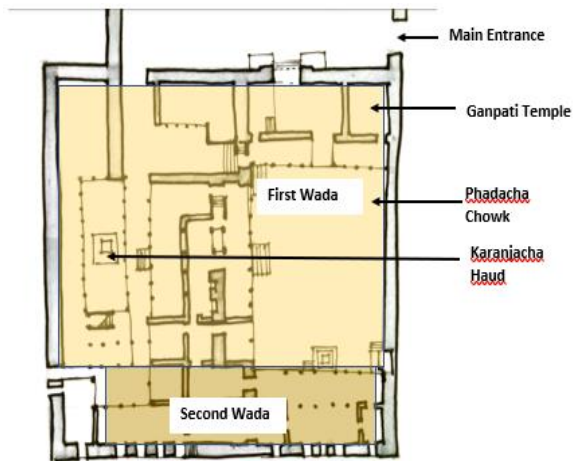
Sketch Plan of Sarkar Wada, Saswad
